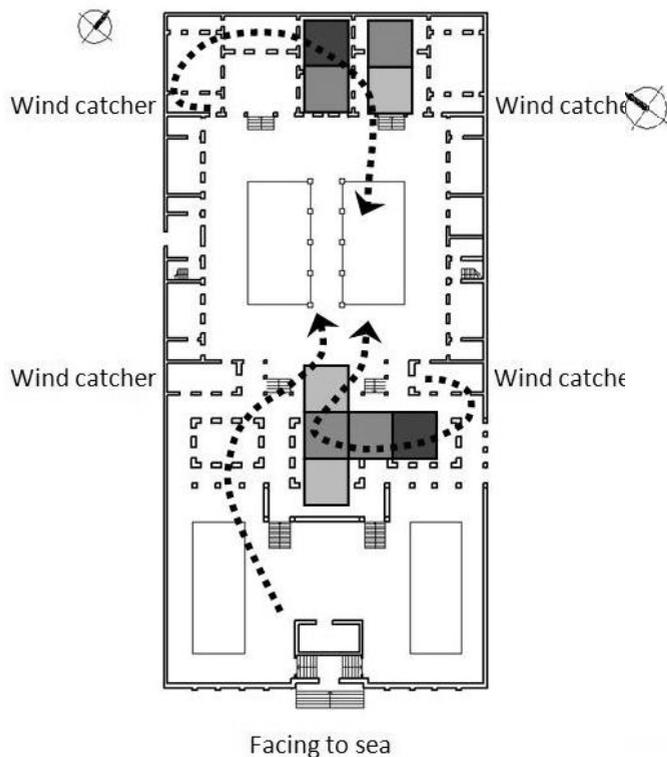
Plan of the ground floor, Fekri House, Bandar-e-Lenge
